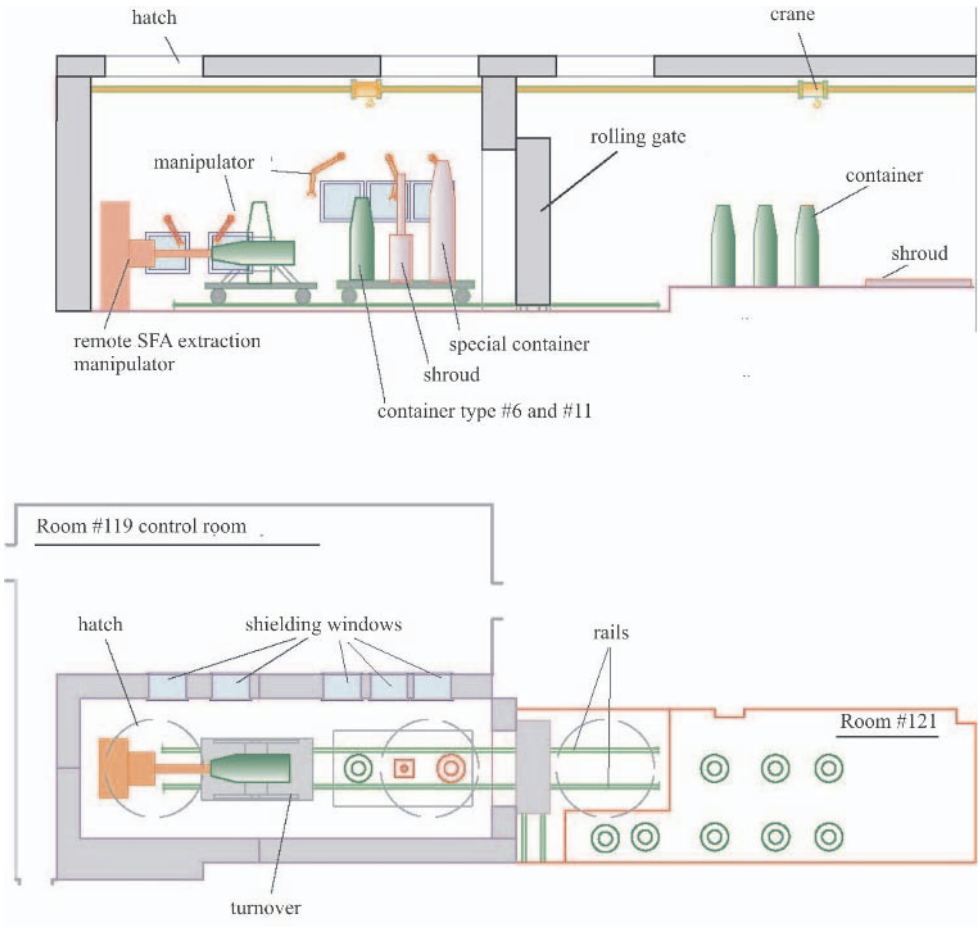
Tentative layout of equipment in shielding chamber to reload SFAs into rooms ##119-121 of Building #1A
